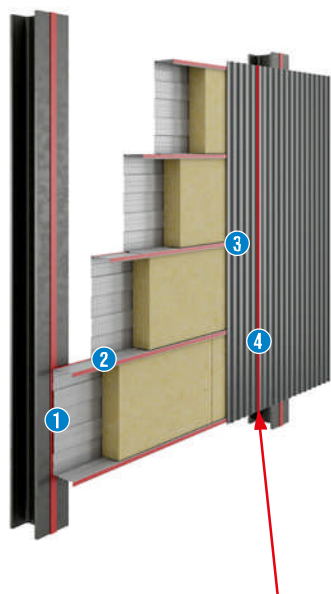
Wall - mounting wall steel sheet profile - selection self-drilling, self tapping fastener
